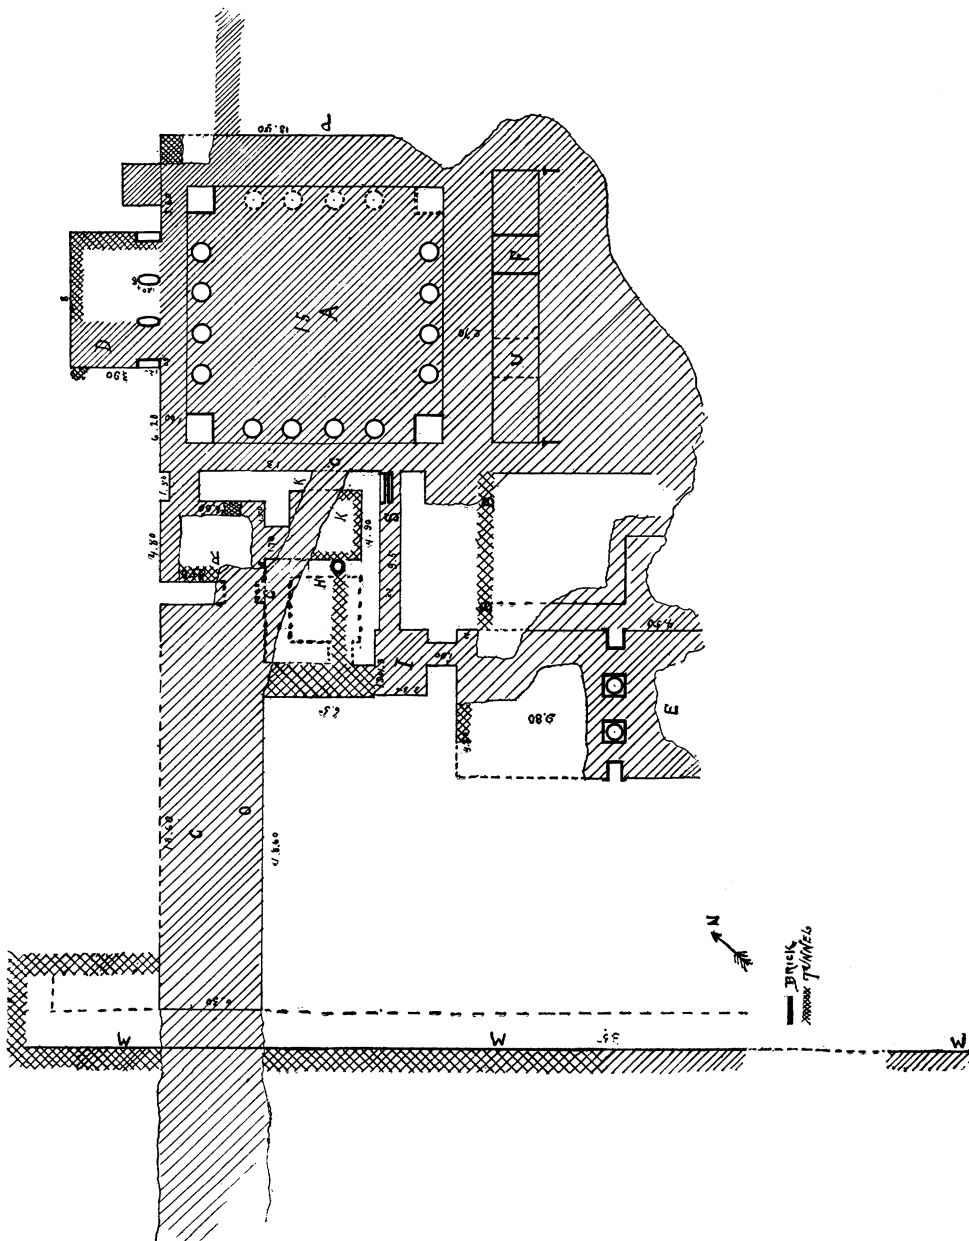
COURT OF COLUMNS AND SURROUNDING STRUCTURE. EXCAVATIONS OF 1890. SOLID STRAIGHT LINES ARE WALLS; DOTTED STRAIGHT LINES SUPPOSED WALLS; SHADED PORTIONS, EXCAVATIONS.
